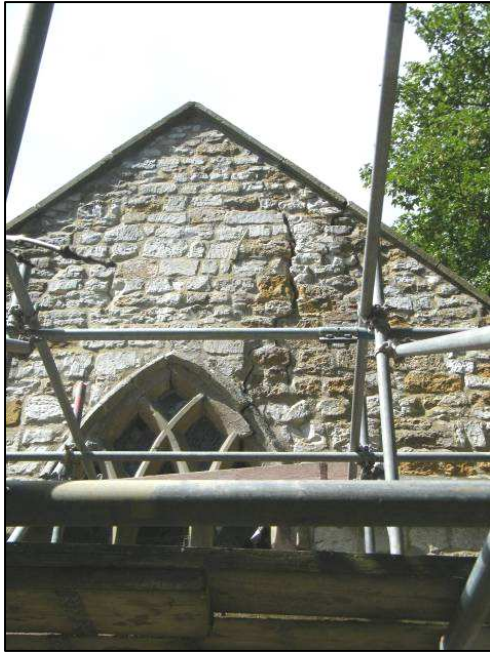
(shot 54): Crack through masonry wall and tracery window, east elevation
